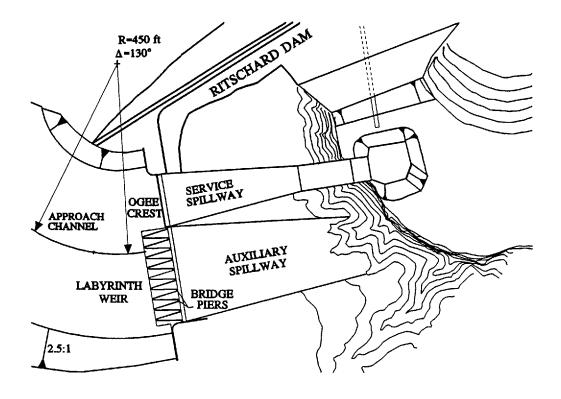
Plan view of proposed Ritschard Dam spillways.
